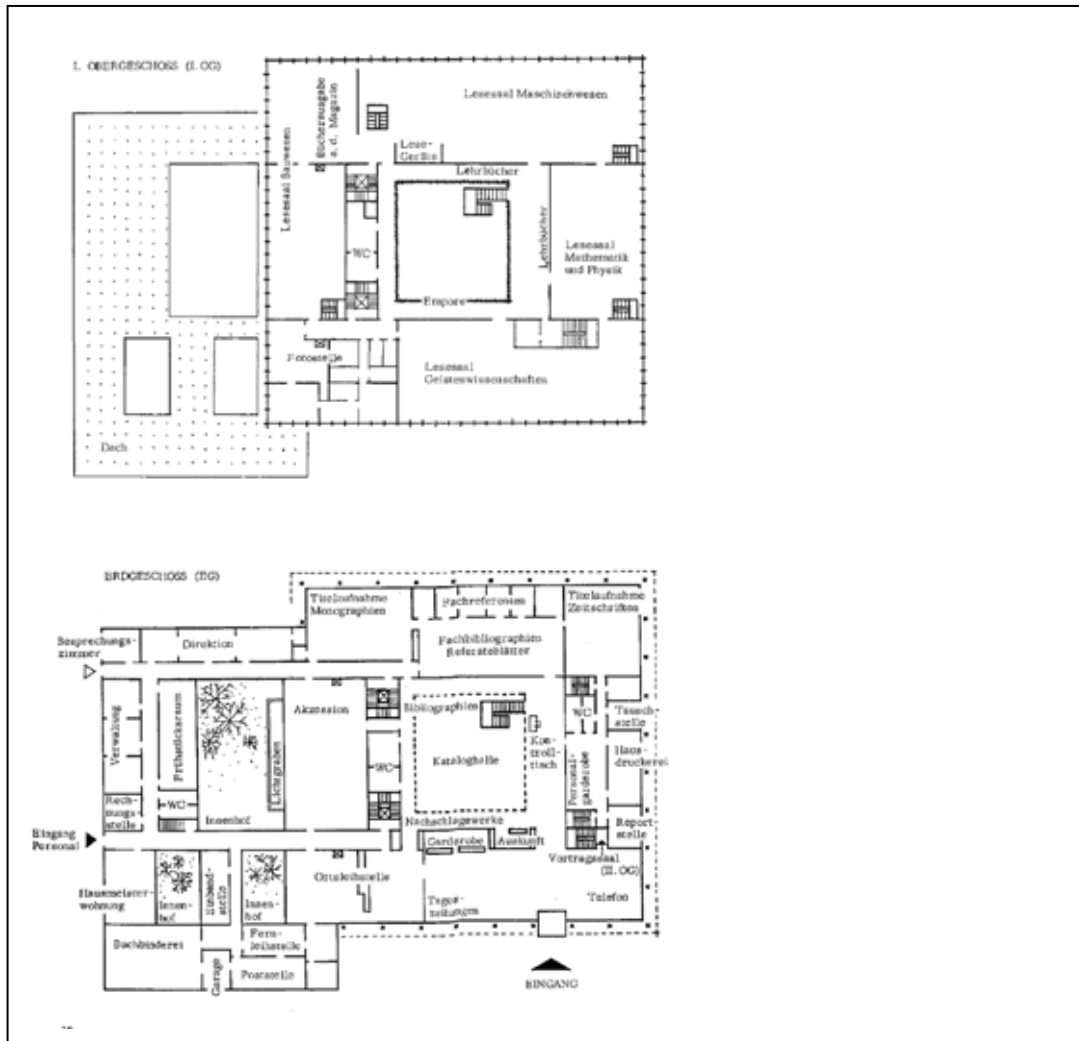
First Floor and Ground Floor (as planned in the first layout) © TIB/UB
